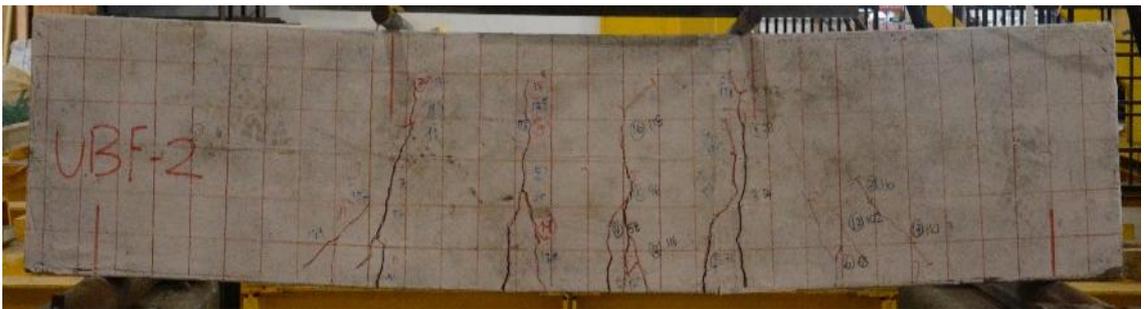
Crack pattern after failure for un-strengthened solid beam (VUSB)
